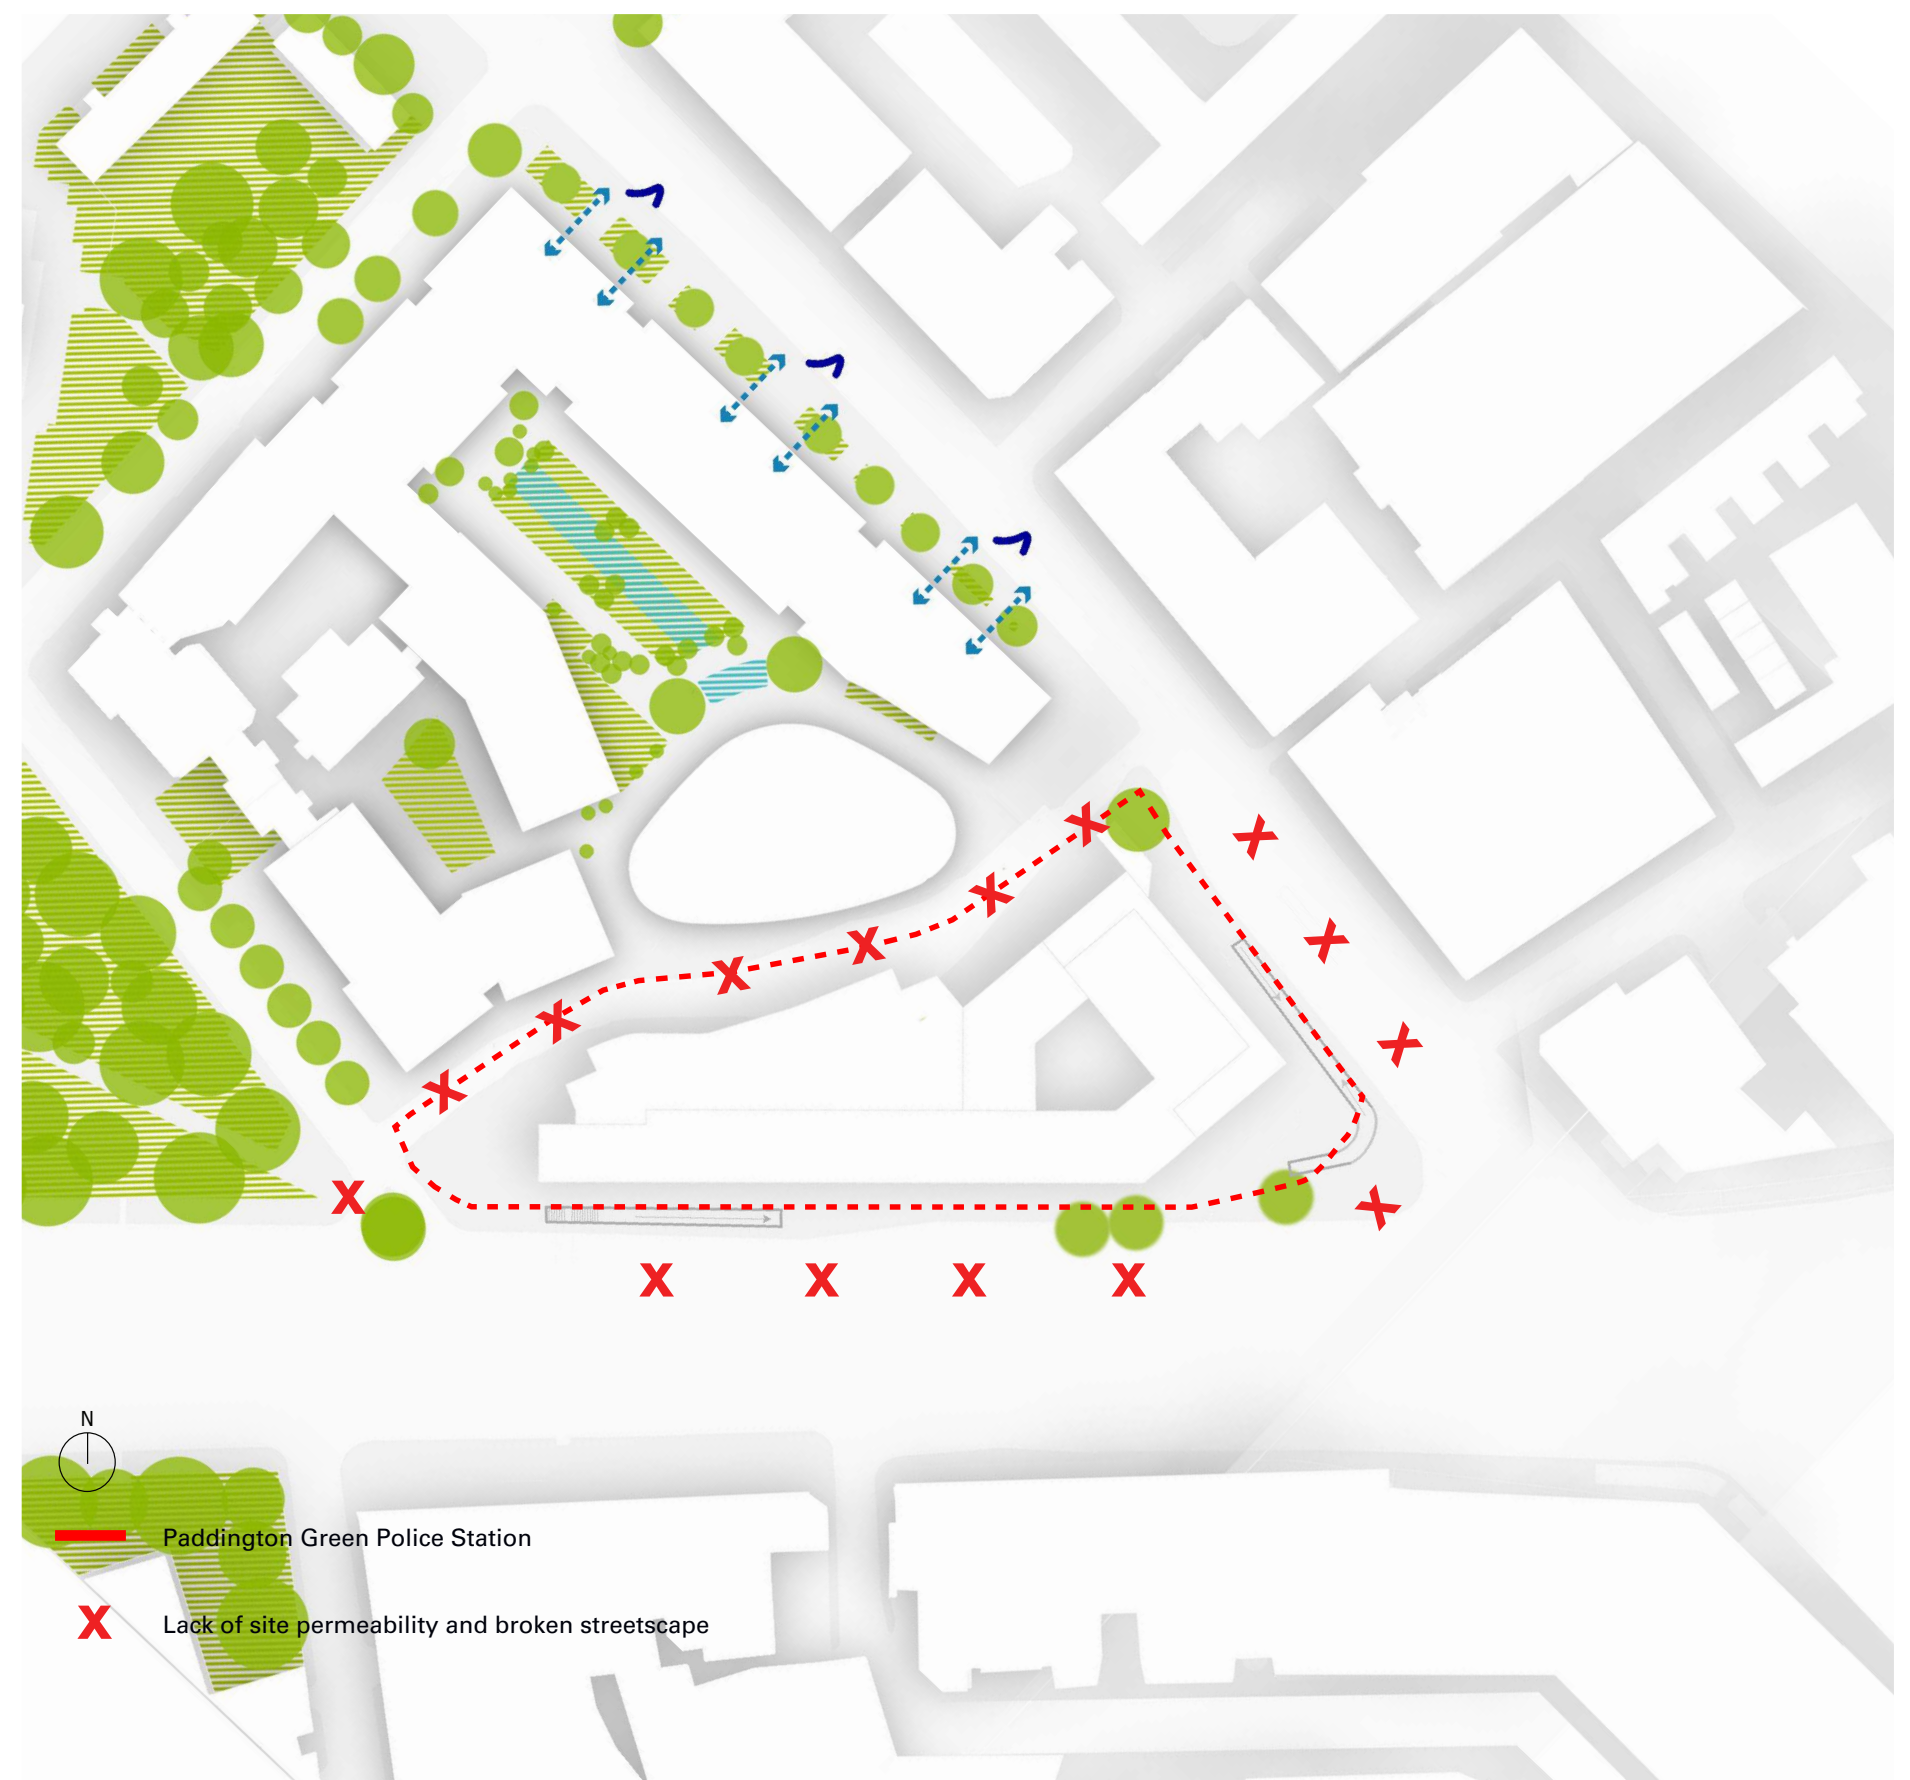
Paddington Green Police Station - Existing site constraints
